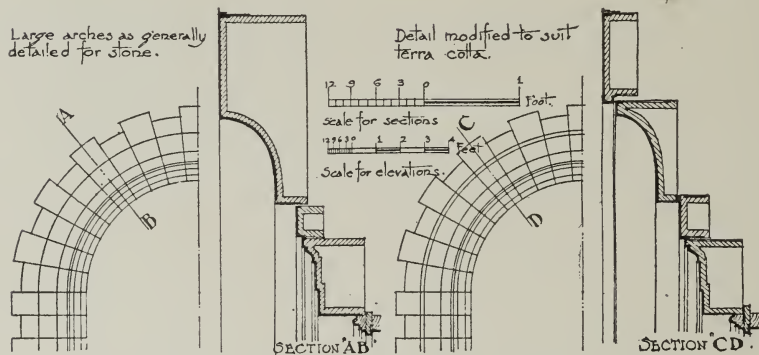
Large Terra-cotta and Stone Arch Construction Compared.
